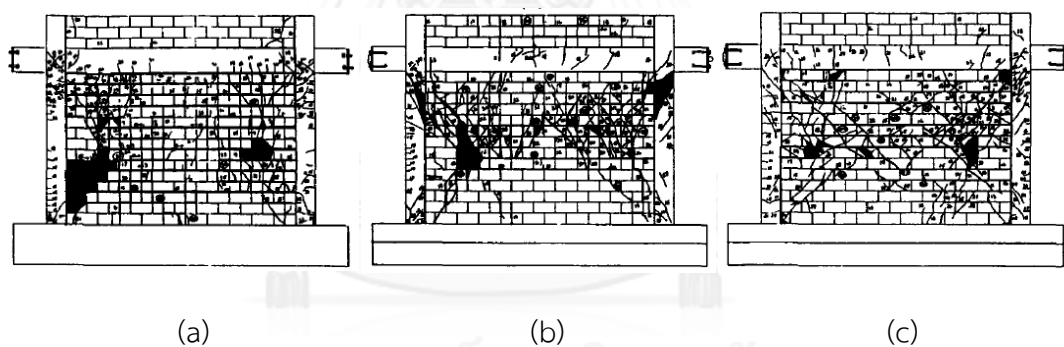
Failure mechanism of test specimens: (a) sliding of bed joint; (b) Shear failure of columns; (c) Corner crushing of masonry infill panel (Mehrabi et al. 1996)
